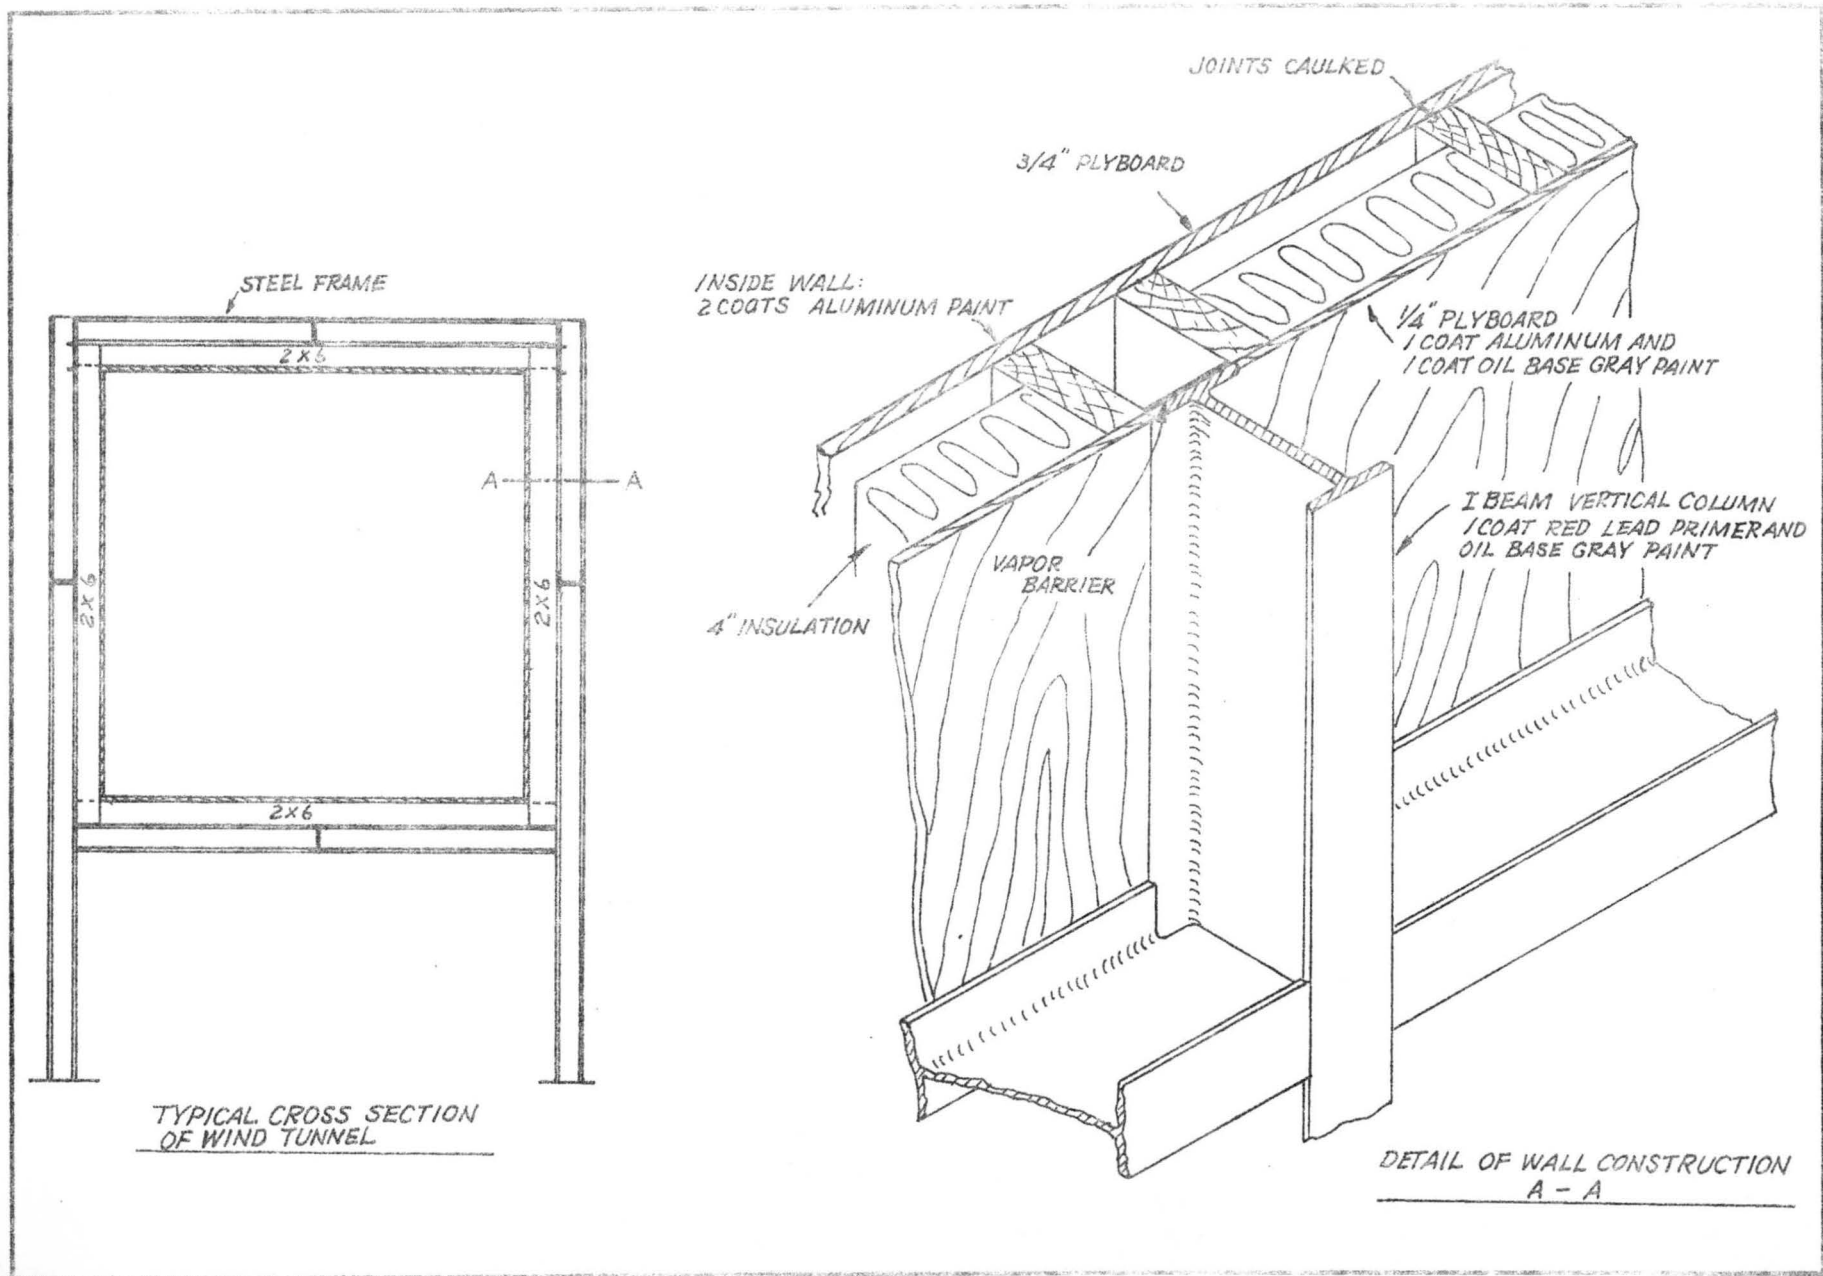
LARGE WIND TUNNEL CONSTRUCTION
